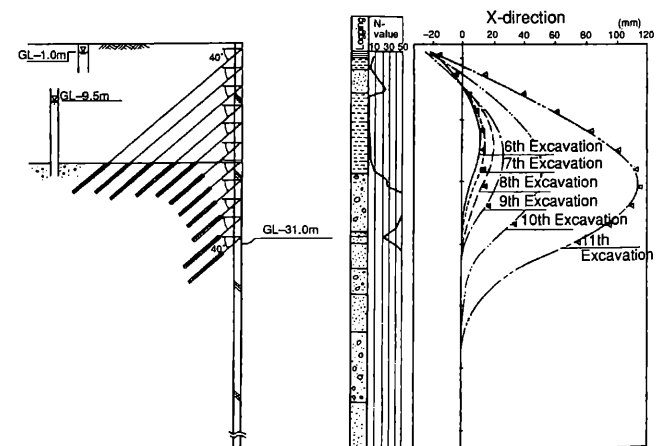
Displacement Distribution in Depth of Earth Retaining Wall (North Side: No. 18 Point)
